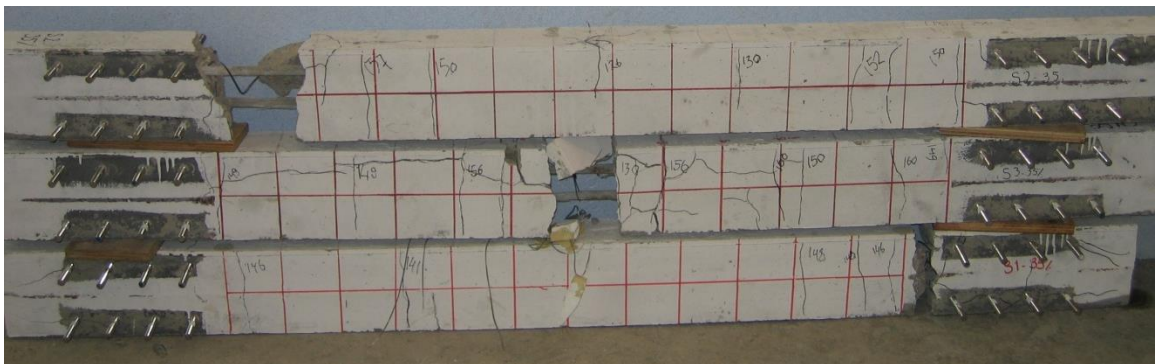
Crack Pattern and Mode of failure of Straps Prestressed at 35%-A
